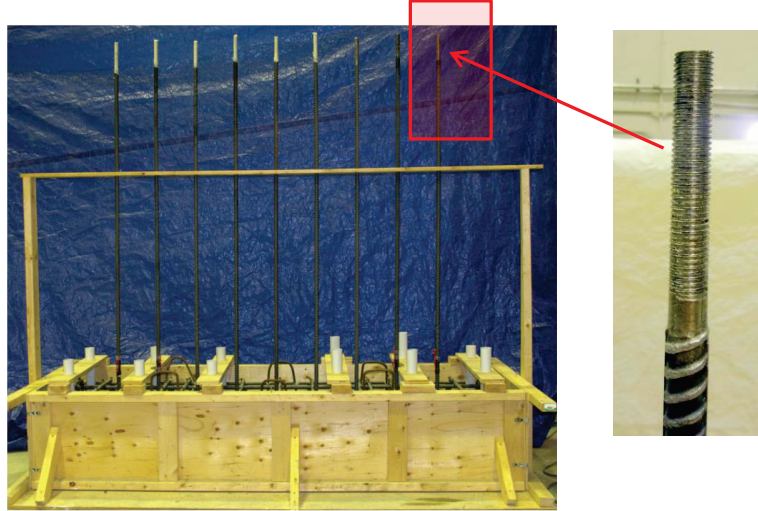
Threaded part of the vertical reinforcement of the studied RM shear walls
